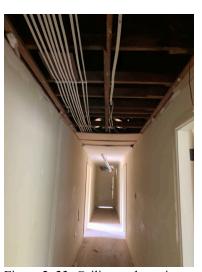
23: Ceiling and cornices removed in hallway in Building B1.
